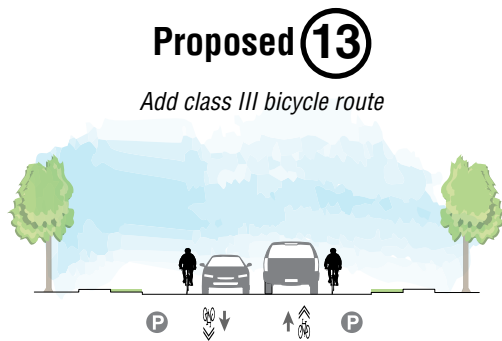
Santa Fe Street South of Damon Avenue
